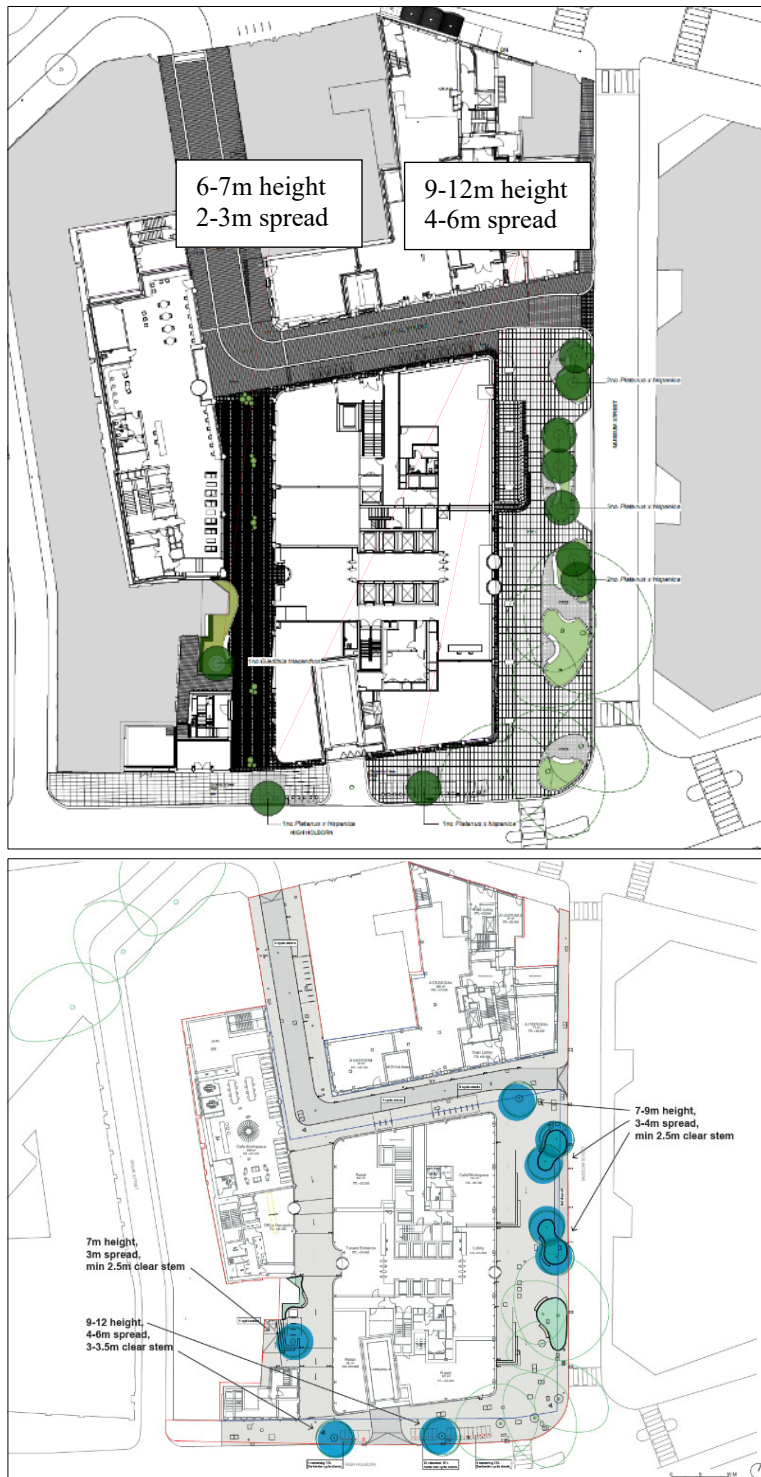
Proposed indicative ground landscaping layout (top); landscaping layout which informed modelling in the wind tunnel (bottom)
